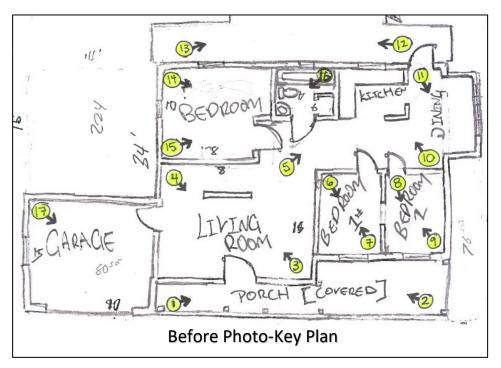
Hand-drawn plan example with Photo Key, original image courtesy of Damani Crichton, a high school student. Image sourced from: https://sites.google.com/site/architecture2015edition2/home/drumheller/floor-plans-sketches
